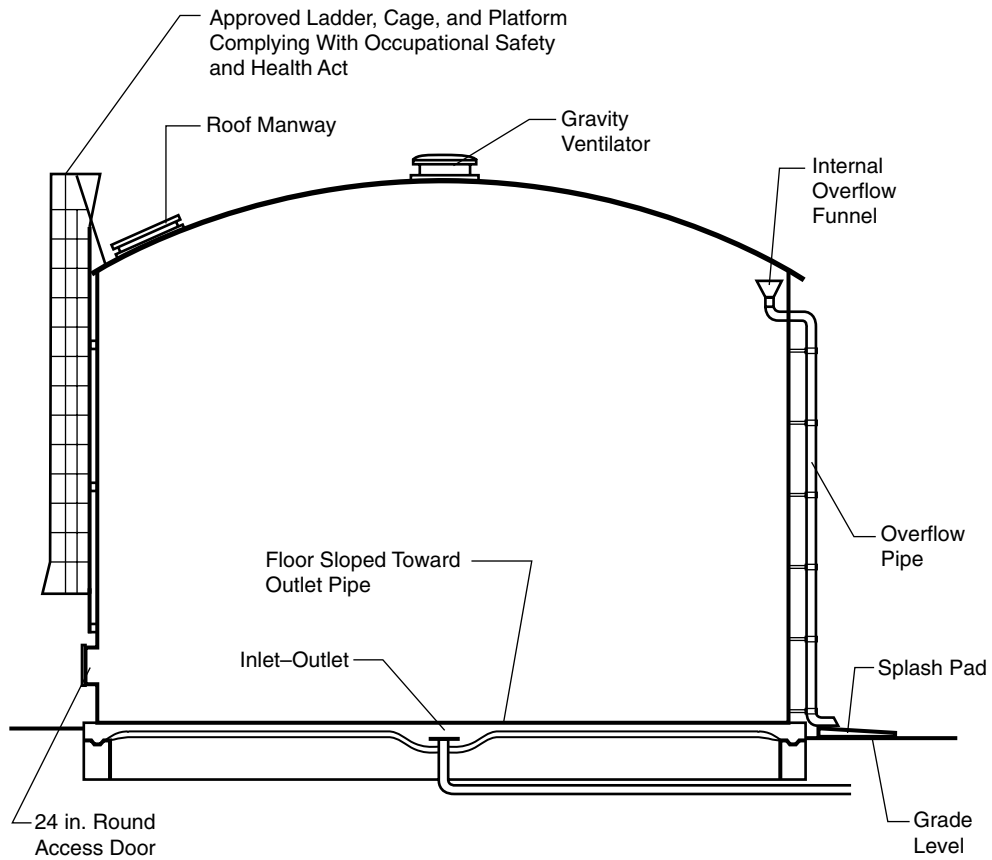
Cross-sectional view of a bolted steel reservoir
